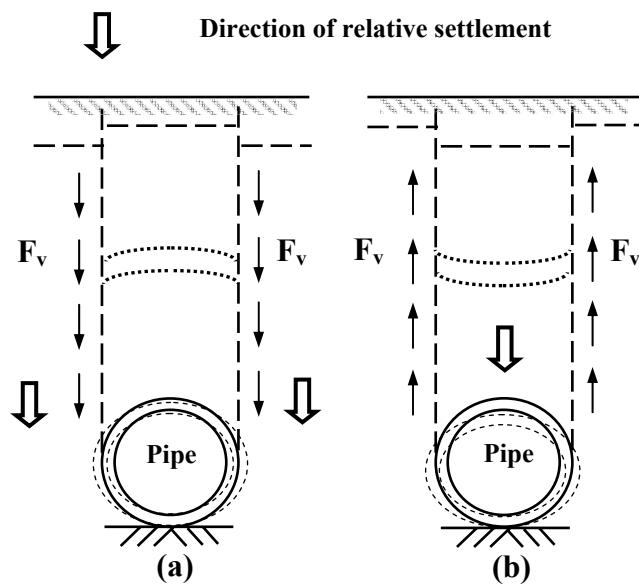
Pressure transfer within a soil-pipe system: (a) corrugated steel pipe in embankment installation and (b) corrugated PVC pipe in embankment installation (F_v = generated friction forces or shear stresses; interface condition= full-bonded)
